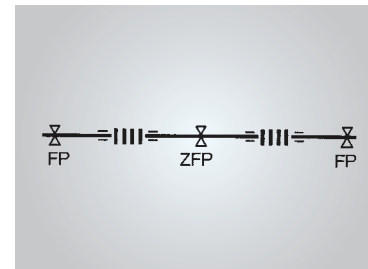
Straight pipe run, subdivided into two compensated sections by intermediate anchor
